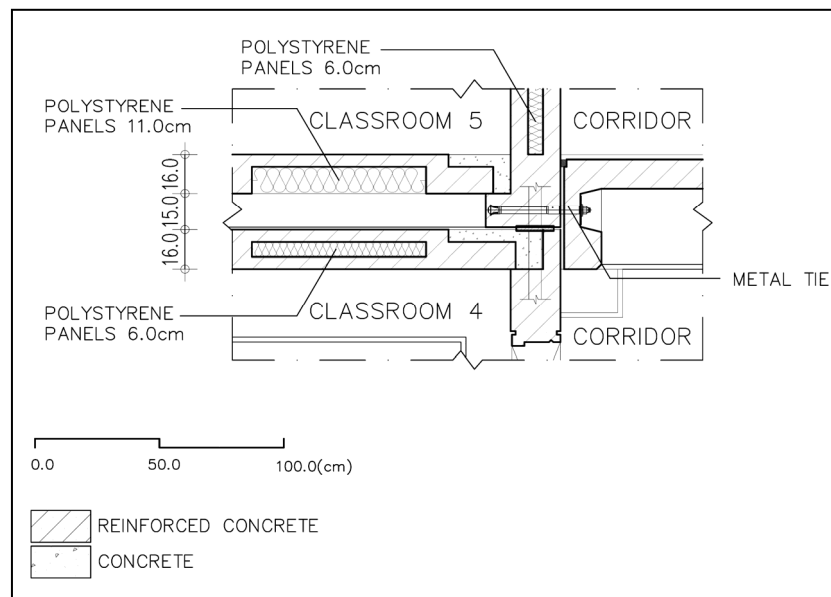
Drawing detail of concrete slab (partition type C) at the junction with corridor.
